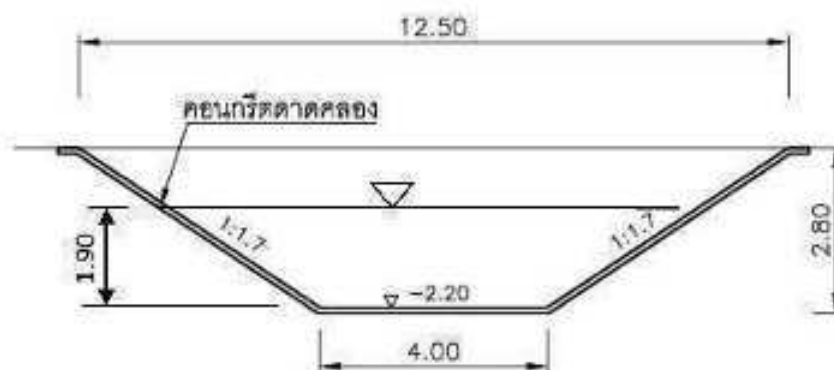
4 Cross Section of New Lining Khlong (Canal)
